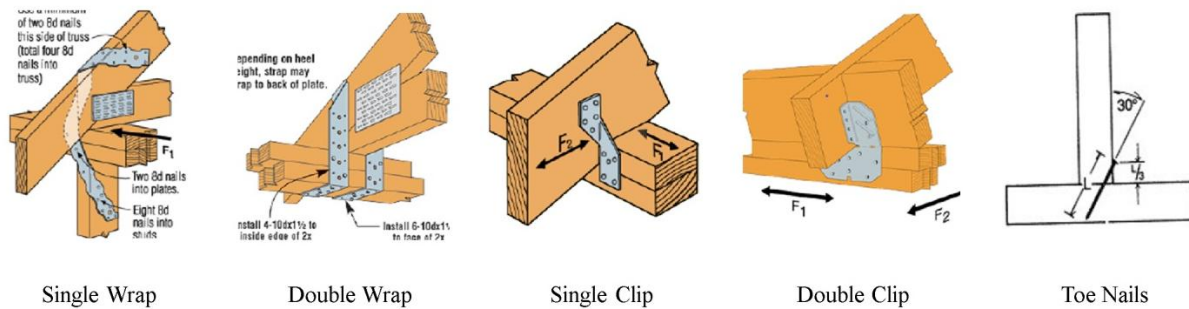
Example Photographs of Roof to Wall Connection (IBHS, 2011)
